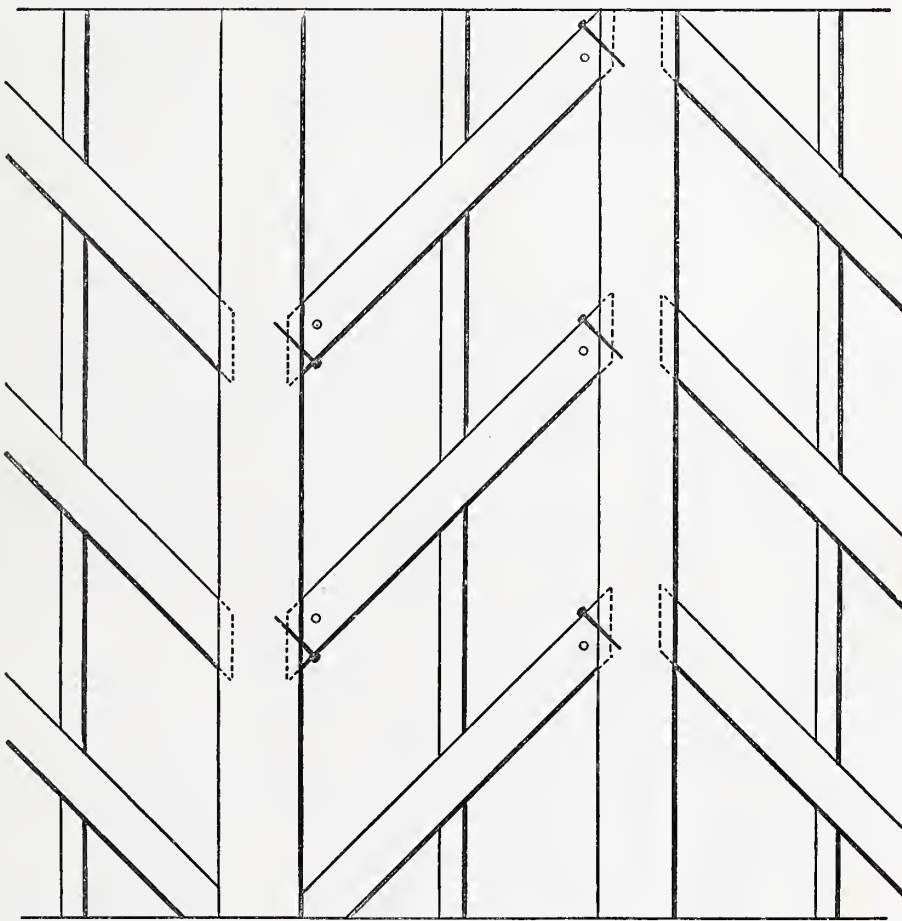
Wood Ceiling. Plan, showing Alternative Arrangement for Support of Veneering.
